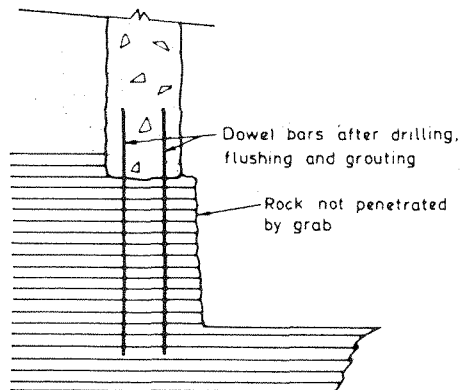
TYPICAL SECTION ON ROCK
